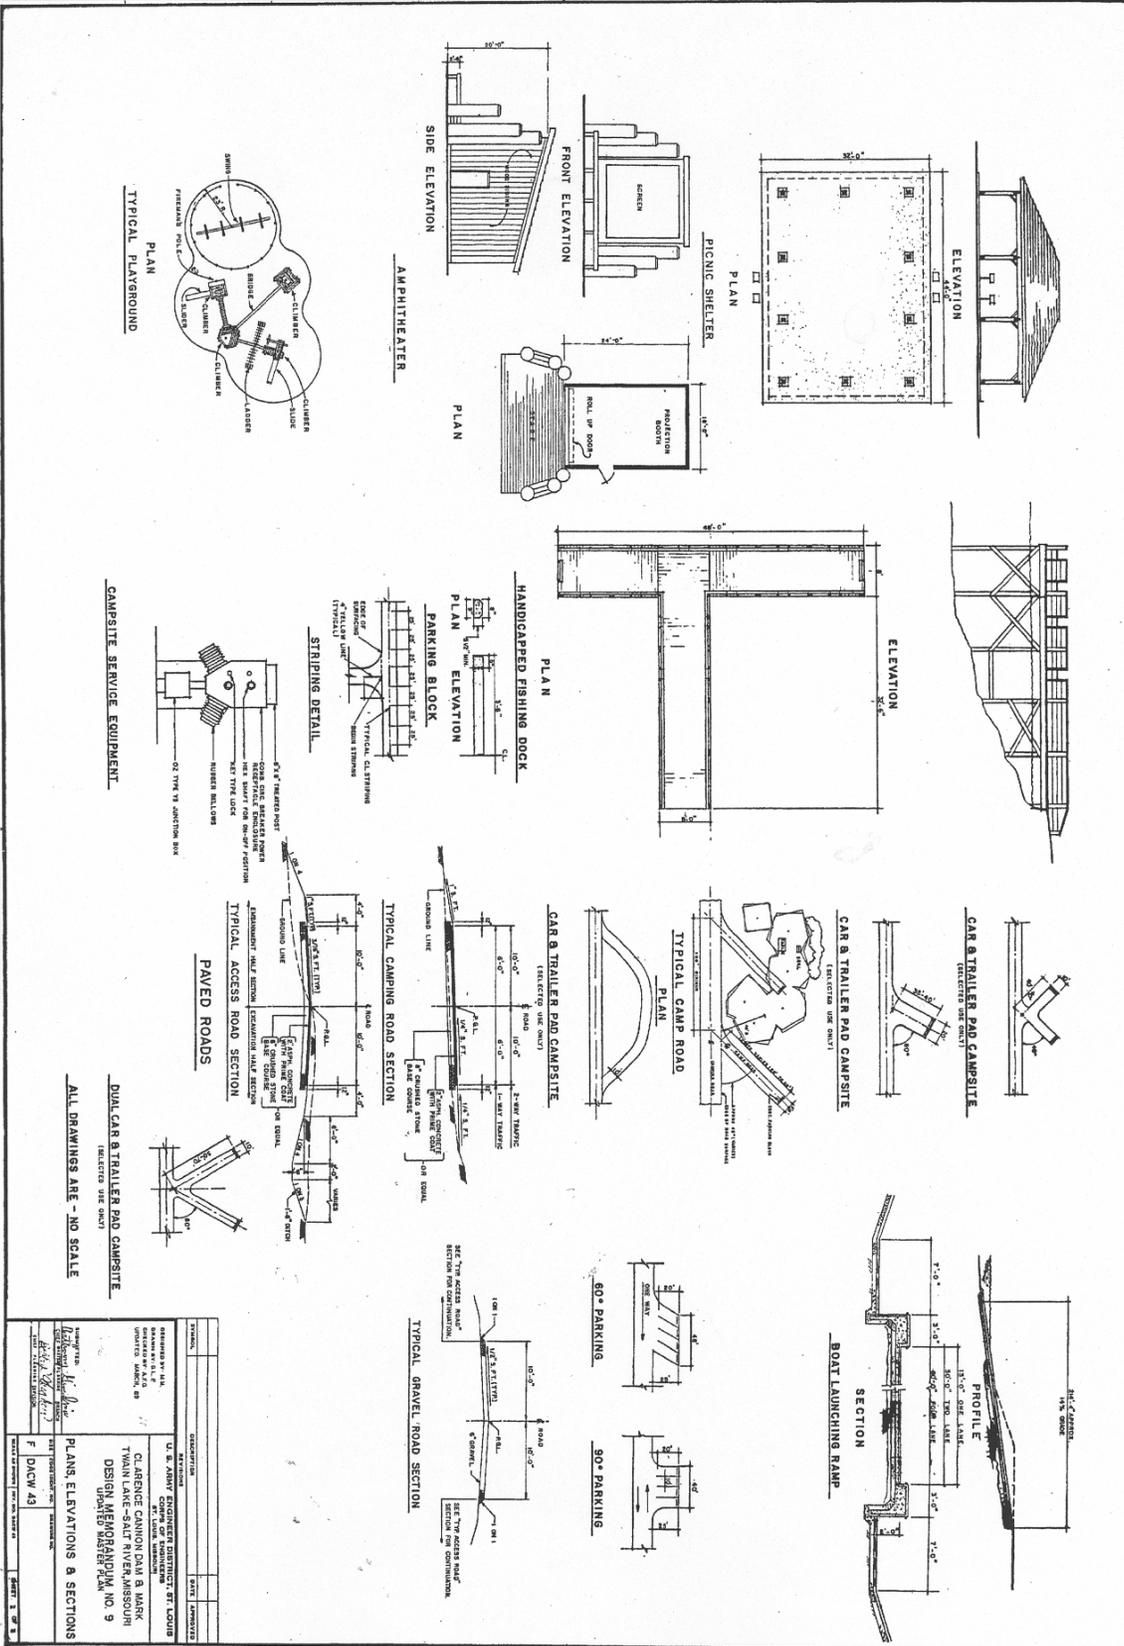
Miscellaneous Plans, Elevations and Sections
